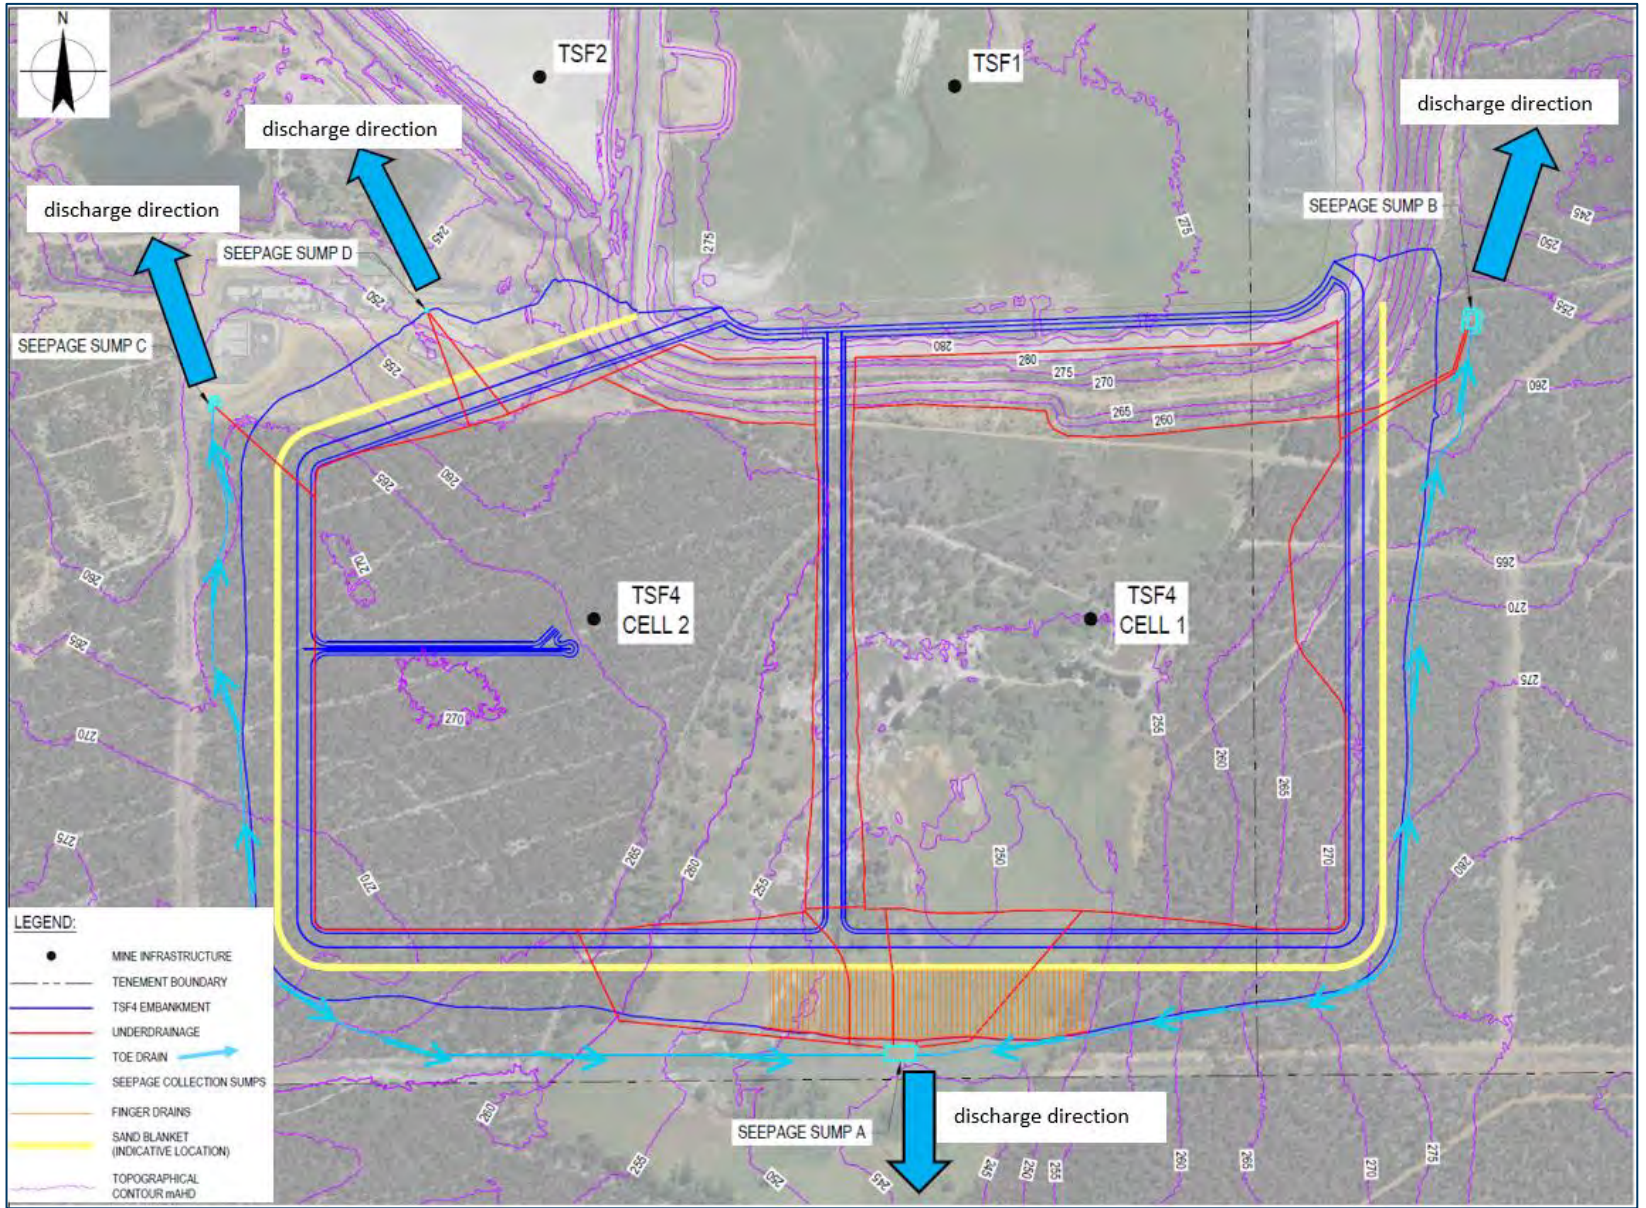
TSF4 Layout Indicating Internal and External Drainage
